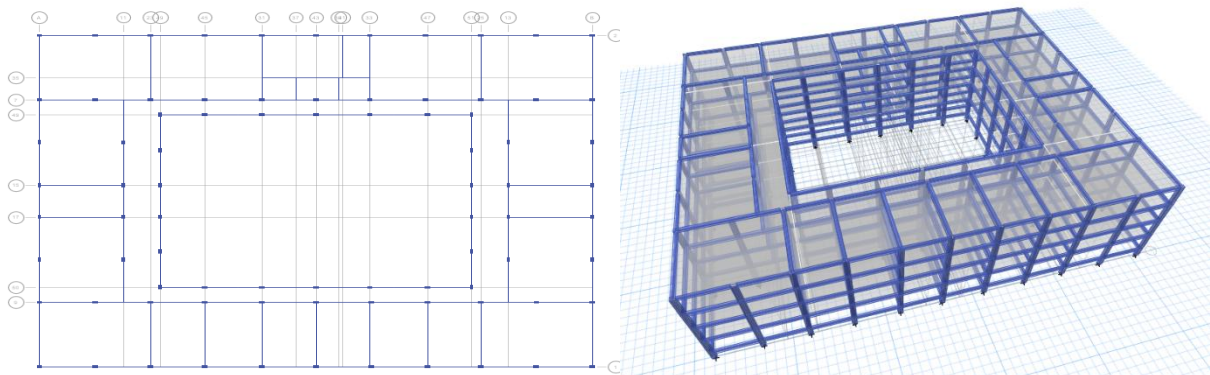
Elevation plan & 3D view for 20% slab opening without shear wall.
